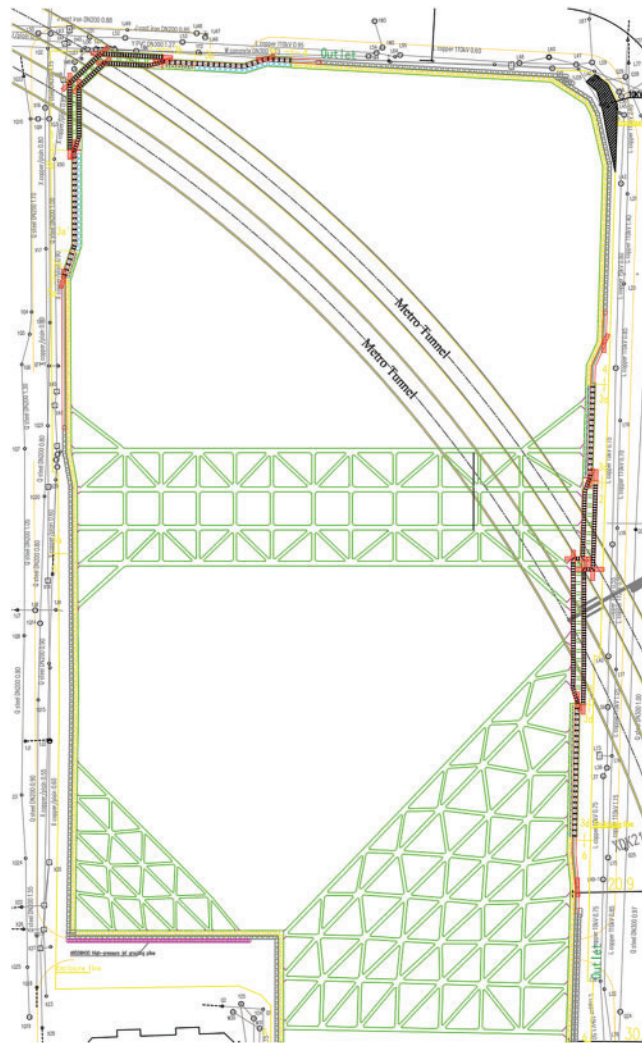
Plan view of the foundation pit and underlying dual-line tunnel (reproduced from Wang et al. [28], Scientific Reports, 2025, licensed under CC BY-NC-ND 4.0)
